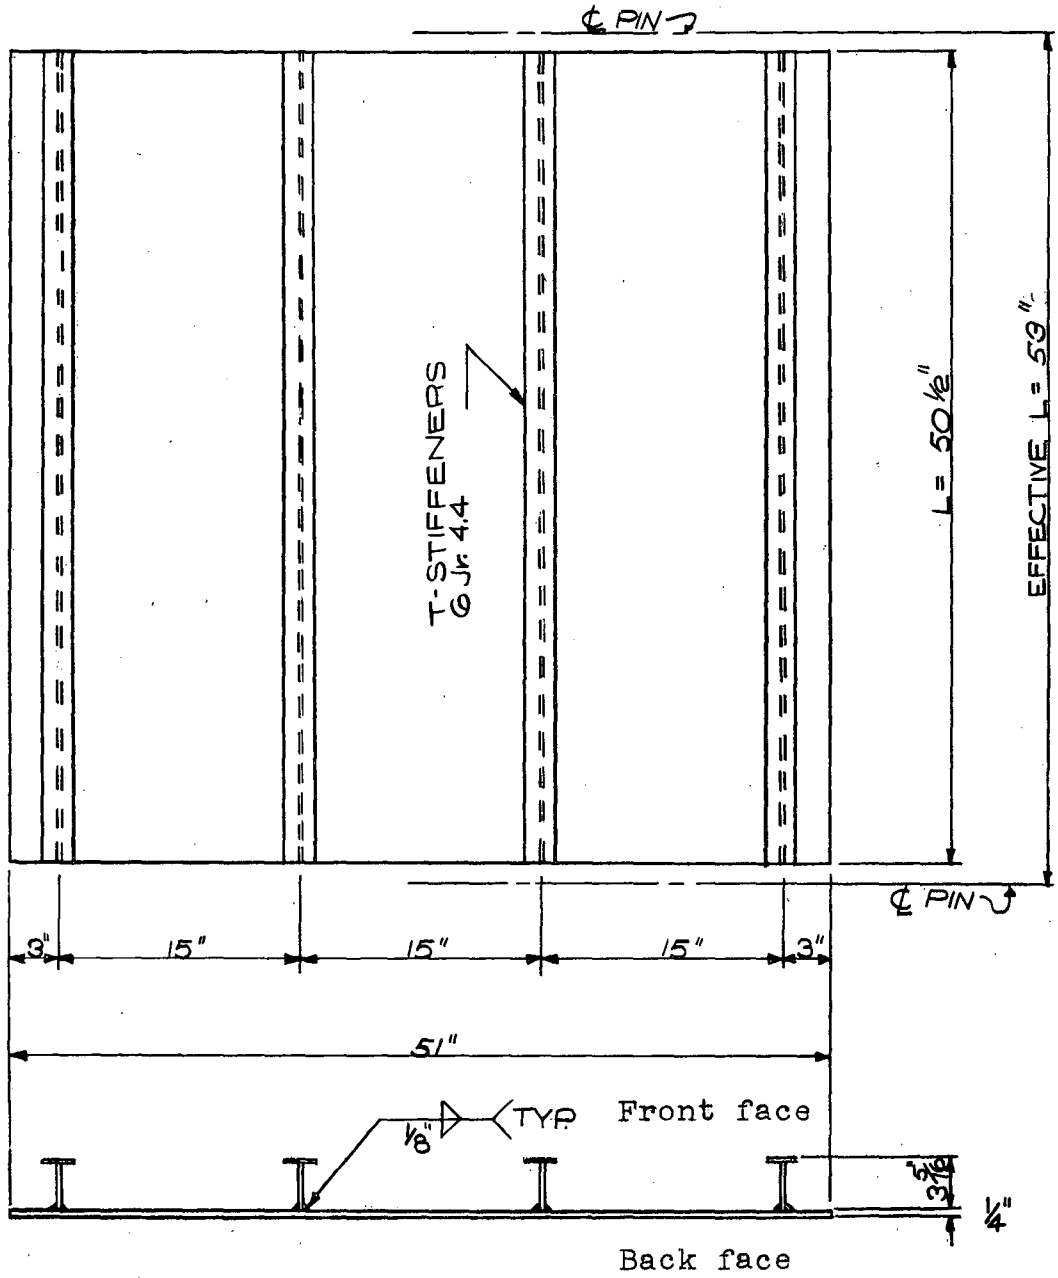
TEST SPECIMEN DIMENSIONS (T-7, T-8, T-9)
